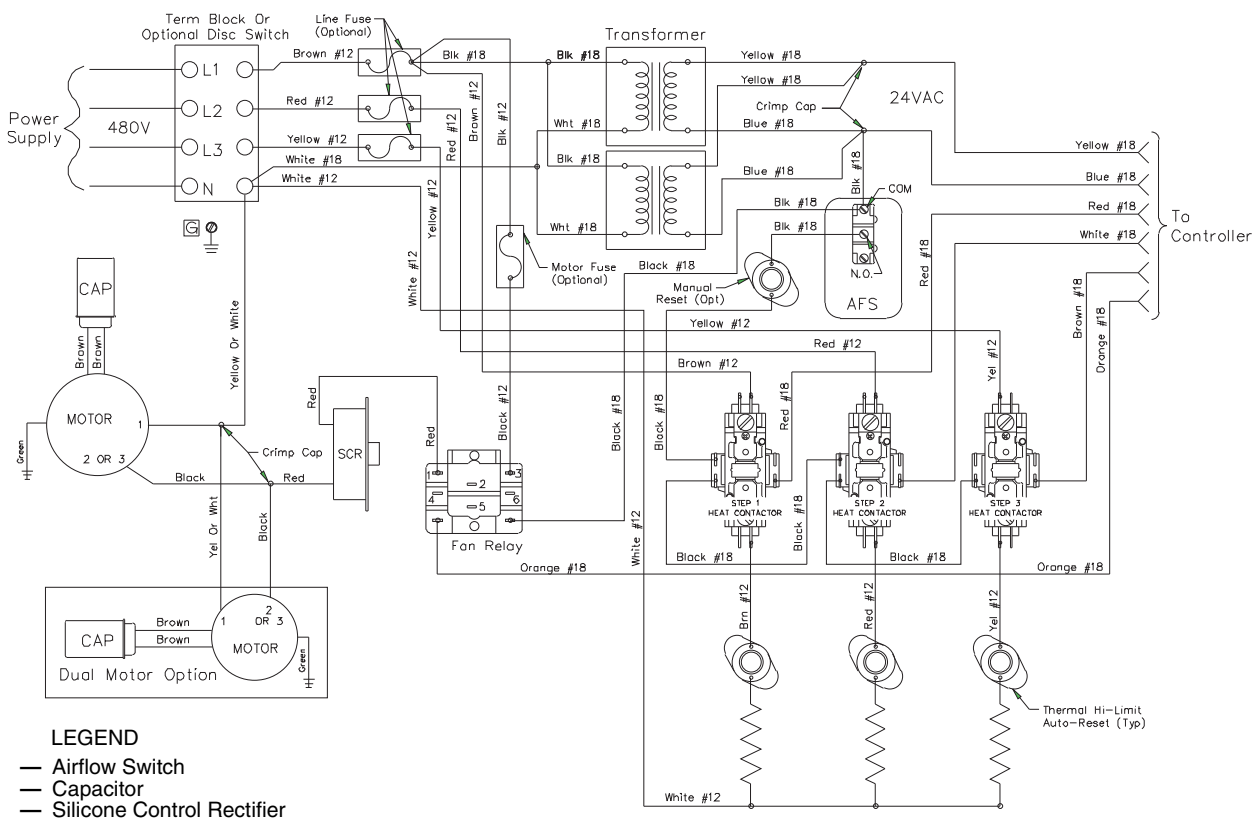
Typical Power Connections for Fan Powered Units with 3-Stage Electric Heat
